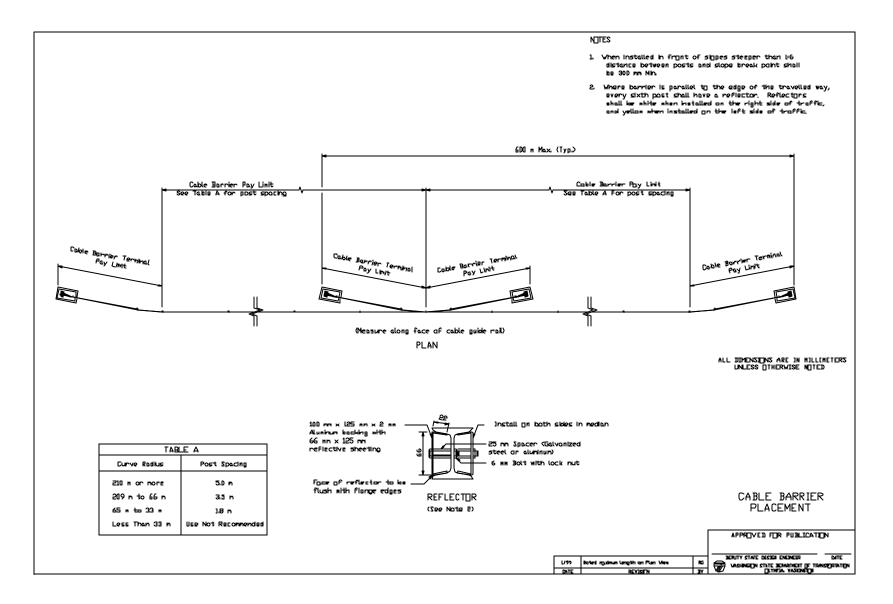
Details of the Washington 3-strand cable barrier for test 404211-8 (continued).
